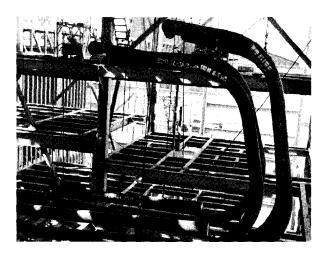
Erection of the main steam piping for all nine units required 548,000 man-hours and 106,000 pounds of welding rod; the largest joints required 125 pounds.
